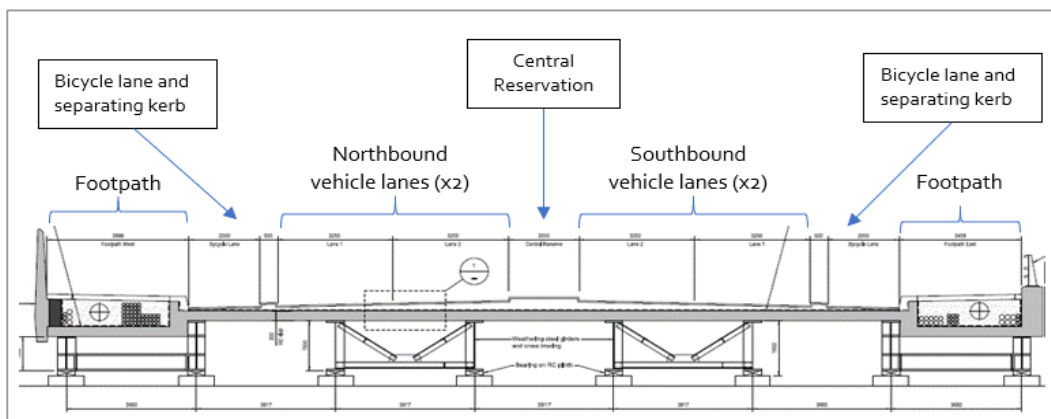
Indicative cross-section illustrating the proposed highway layout (for information only)
